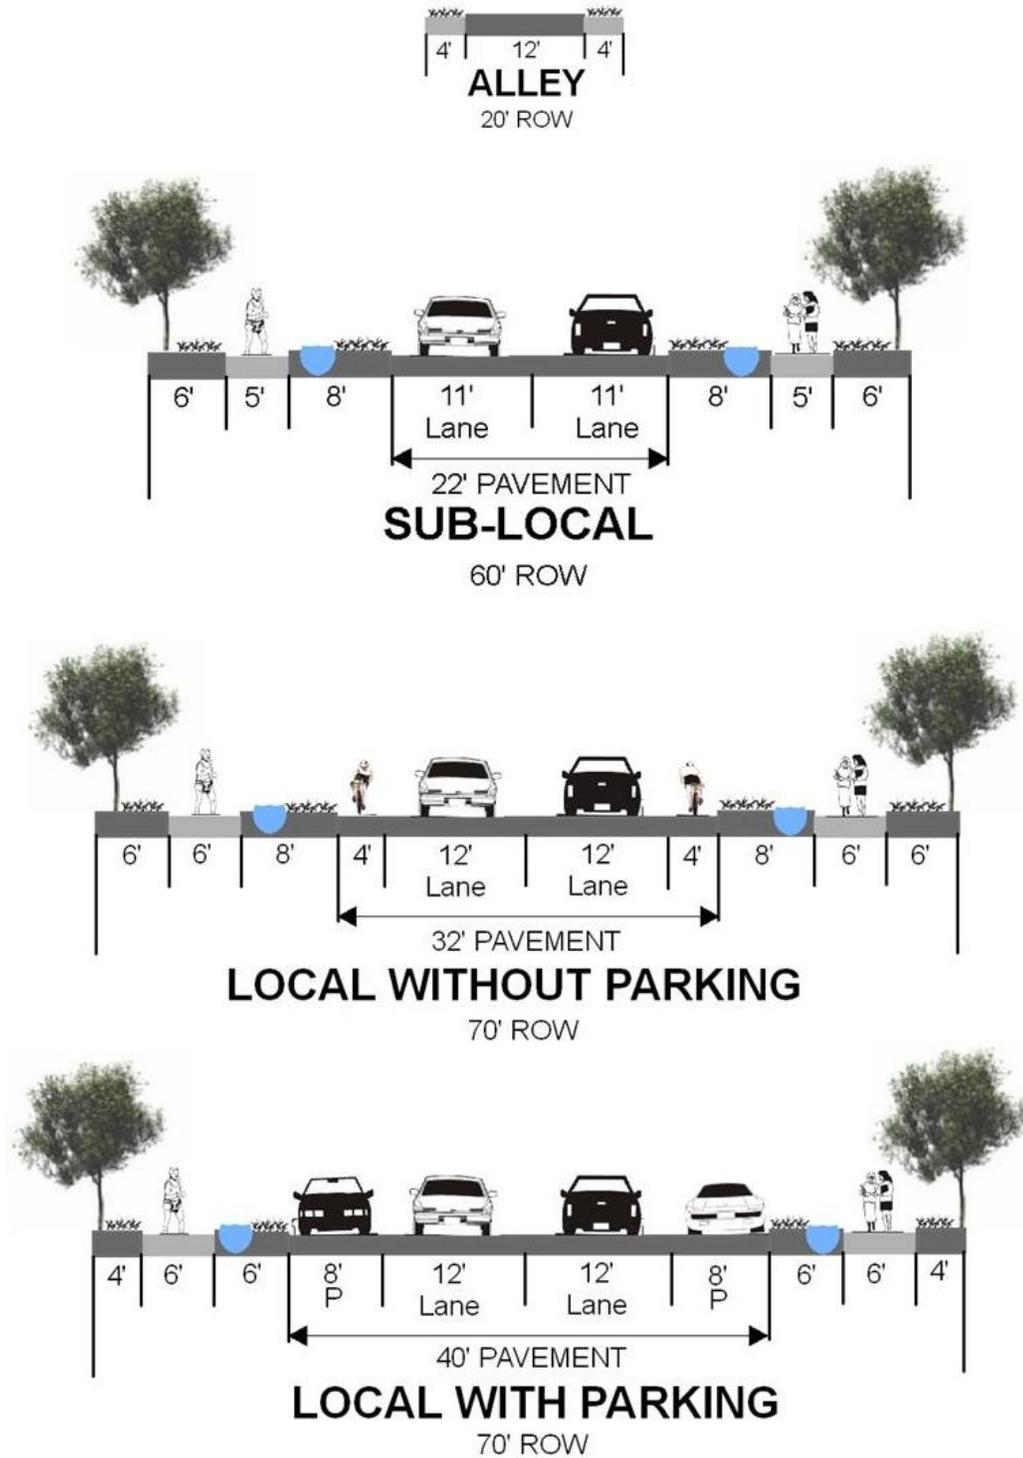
ROAD CONSTRUCTION STANDARDS
